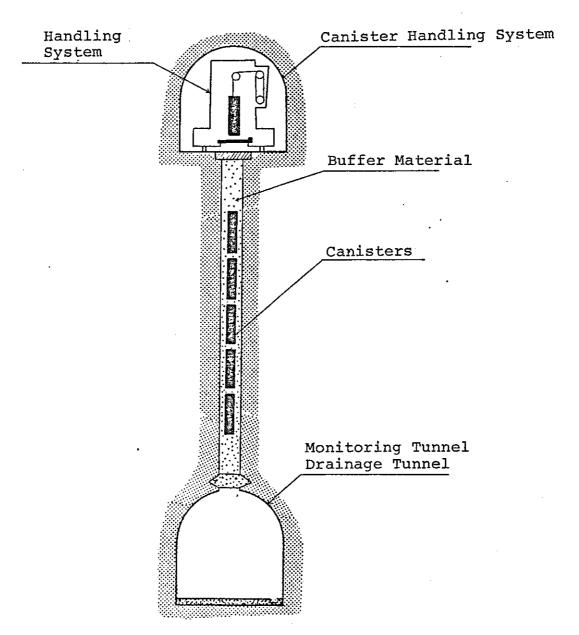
Layout for Disposal Tunnel & Pit (Option B)
